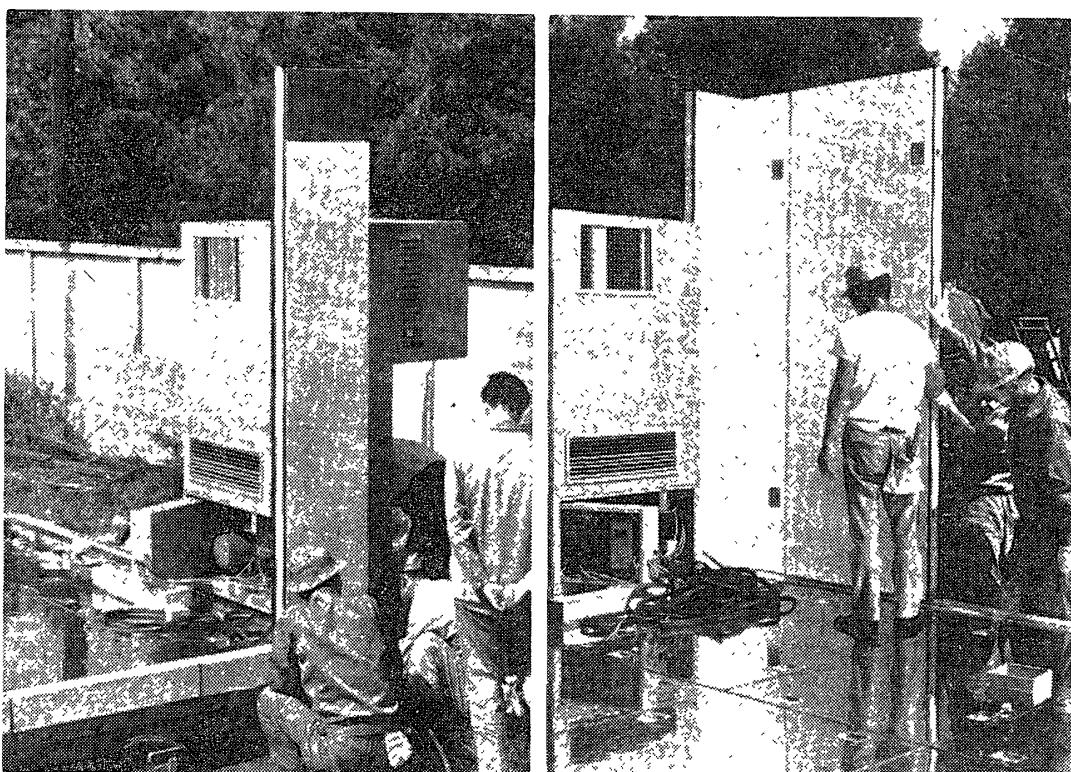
After settling floor panel, L-shaped panel is erected on each corner.
